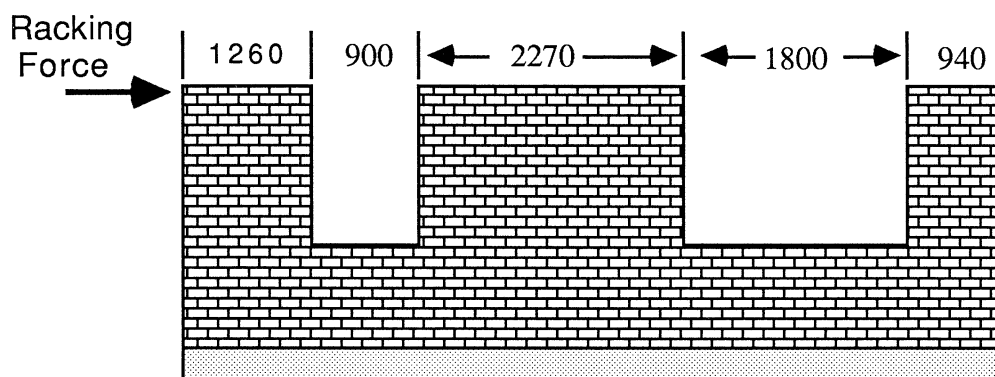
Brick Skin of Wall 1 and Initial Racking Position
